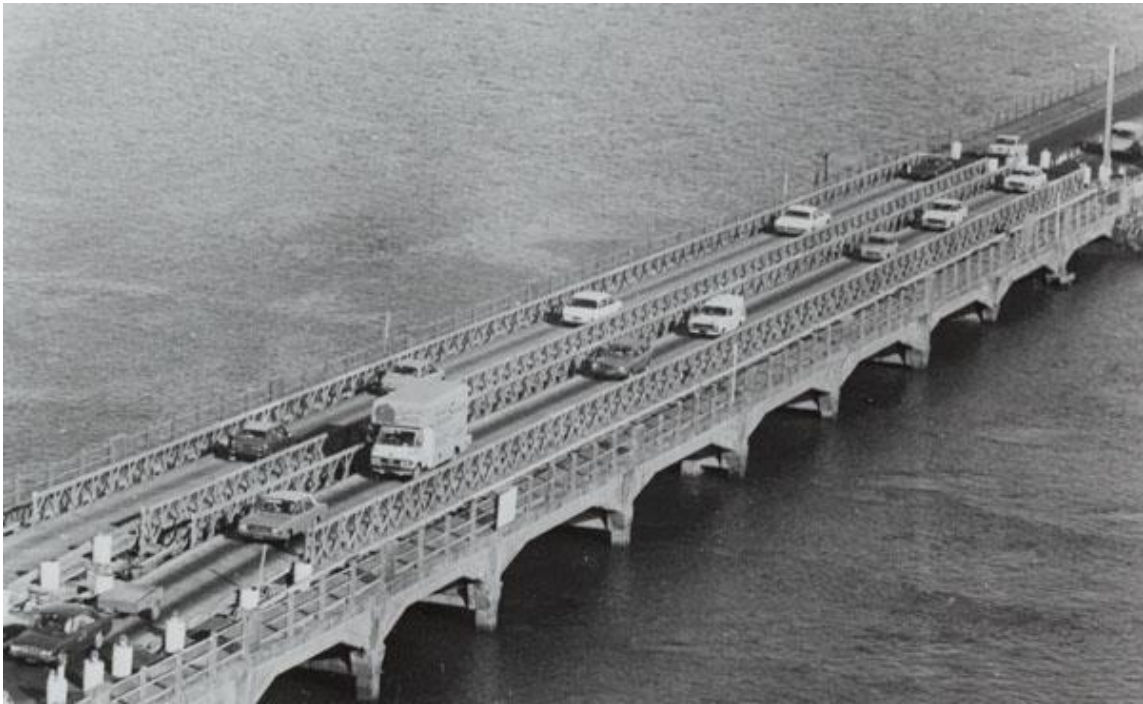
View of the second Māngere Bridge from the third bridge under construction, ca 1980. Note the temporary 'Bailey' bridge over the central span. Auckland Libraries Heritage Collections, photographer unknown. Footprints 01142.
